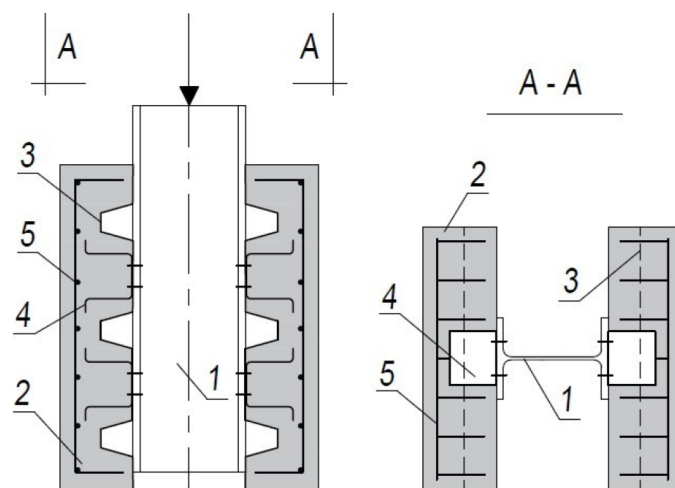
Test specimen for standard push-out test: 1 – I-beam, 2 – concrete slab, 3 – profiled steel sheeting, 4 – U-shaped connector, 5 – reinforcing bars
